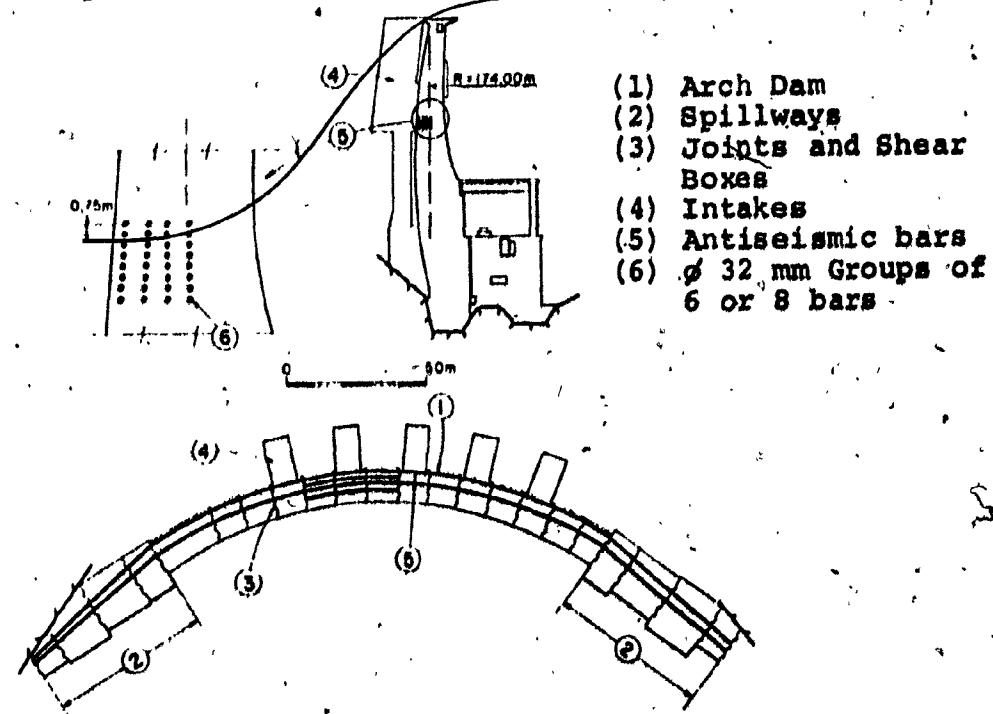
Reinforced Arch - Rapel Dam [9]
